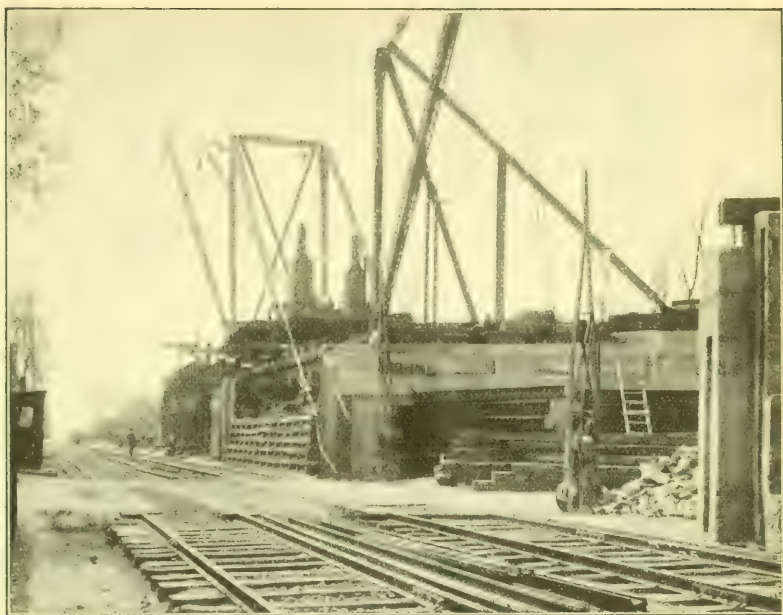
ERECTING BRIDGES, TIOGA SECTION, WEST SIDE.
